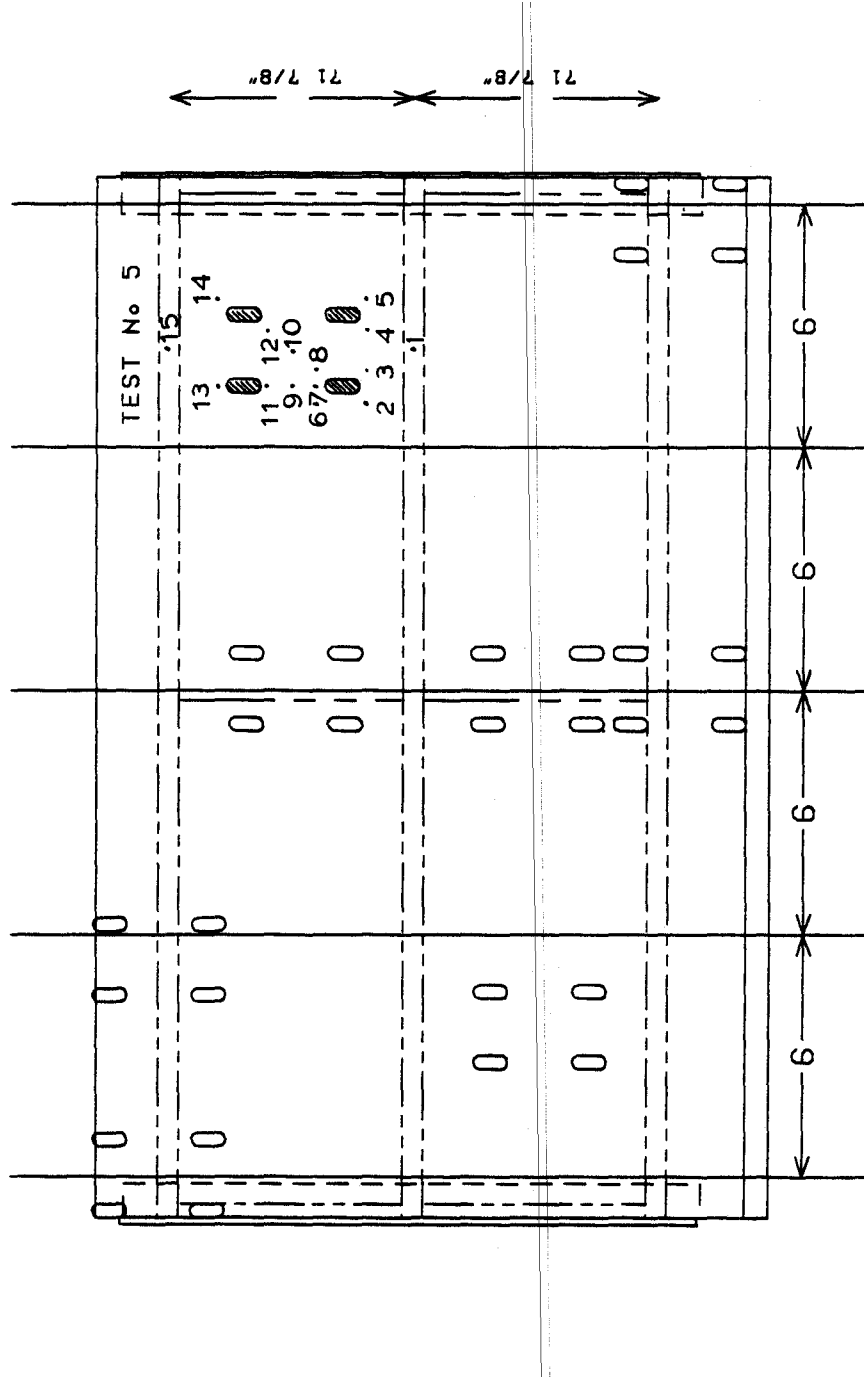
LVDT Locations (Third Bridge - Test No. 5)
